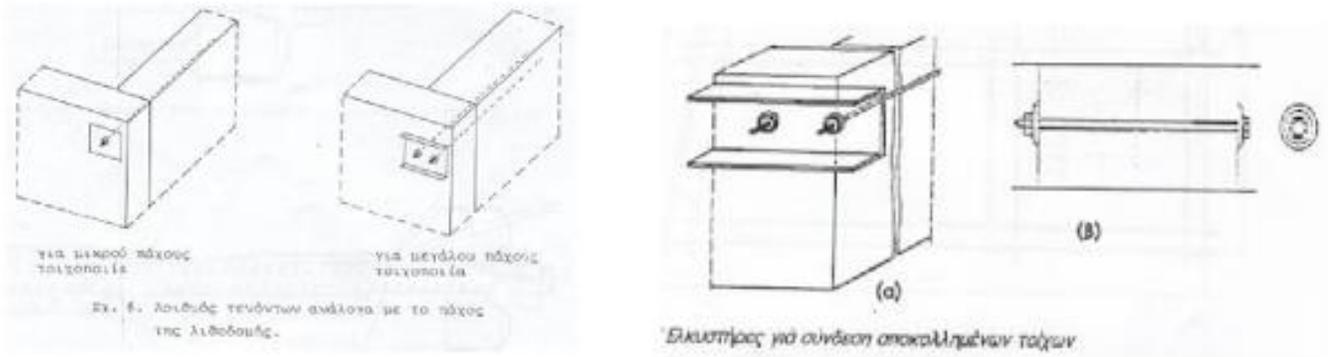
Sketches showing the application of the tension wires in masonry walls.
